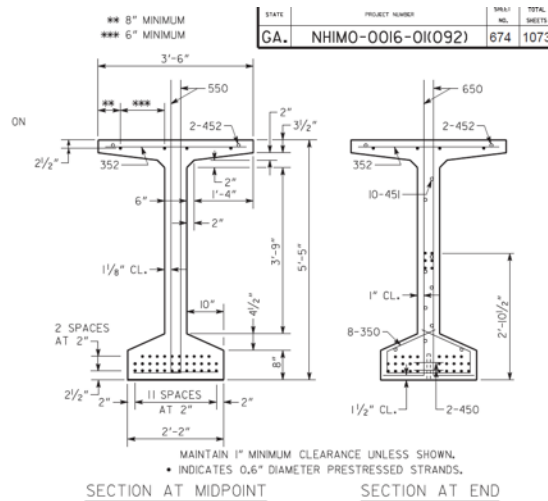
Engineering Drawing. Bulb-Tee section at midpoint and end
